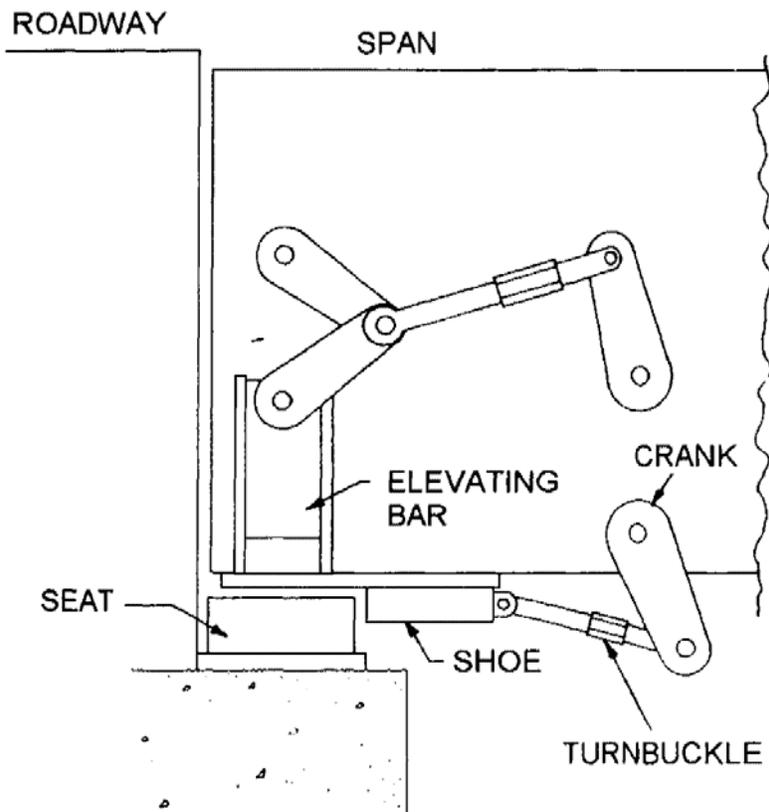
Toggle elevating drive—bar is raised and shoe withdrawn; span is free to rotate
